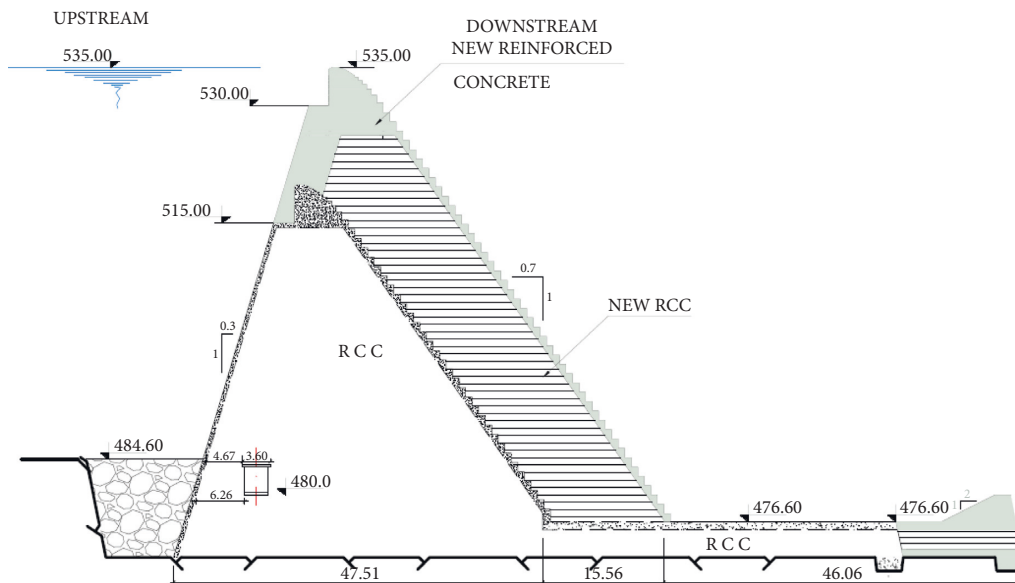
Cross-section of the main body of the Wala dam (original section and new raised section, after JVA, 2015a).
